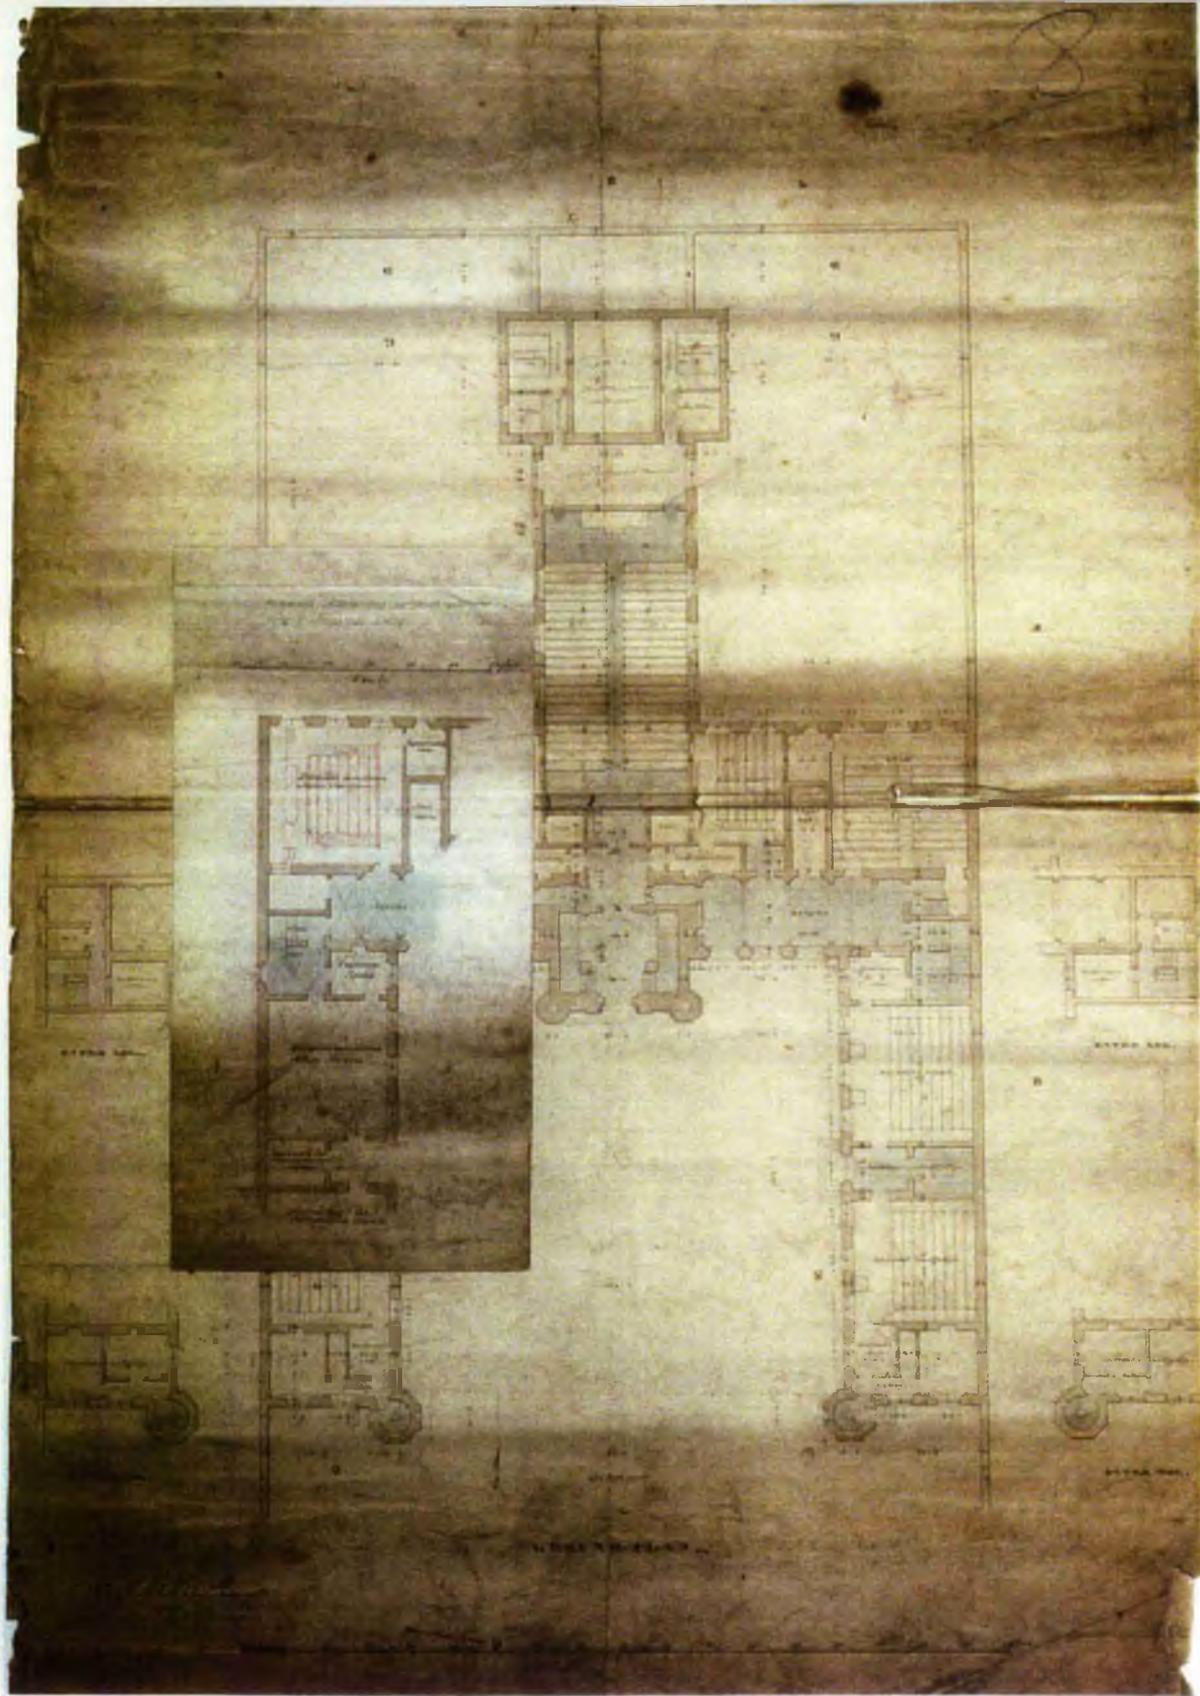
Marischal College. Amended ground floor plan. A. Simpson, June, 1836.
